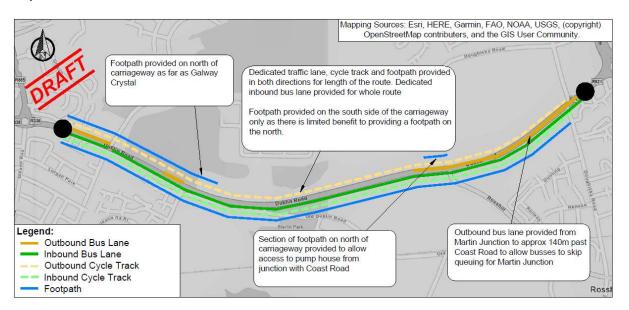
Section 2 Option 6A Indicative Scheme Design
